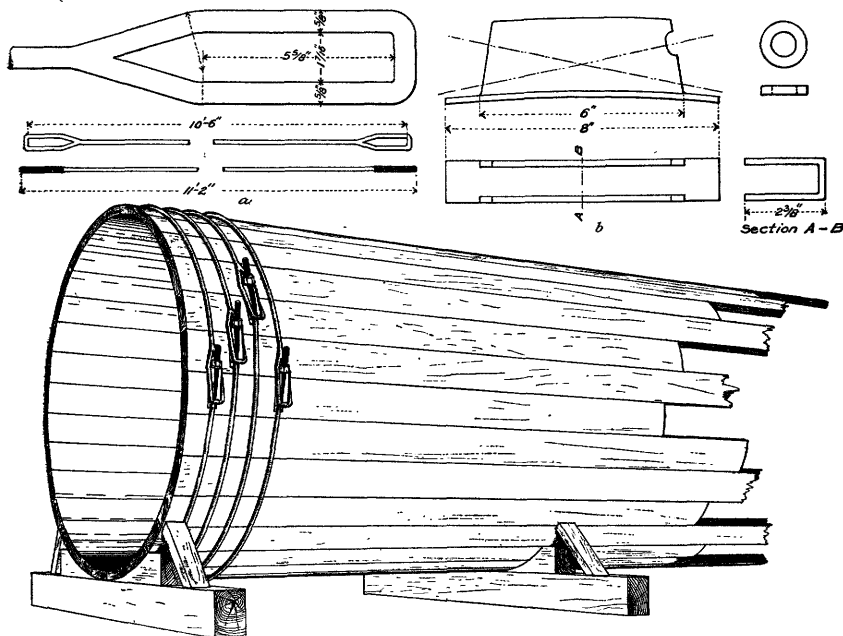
Details of stave pipe built by Pioneer Electric Company, of Ogden, Utah. a, details of steel bands; b, plan and elevation of saddle.
